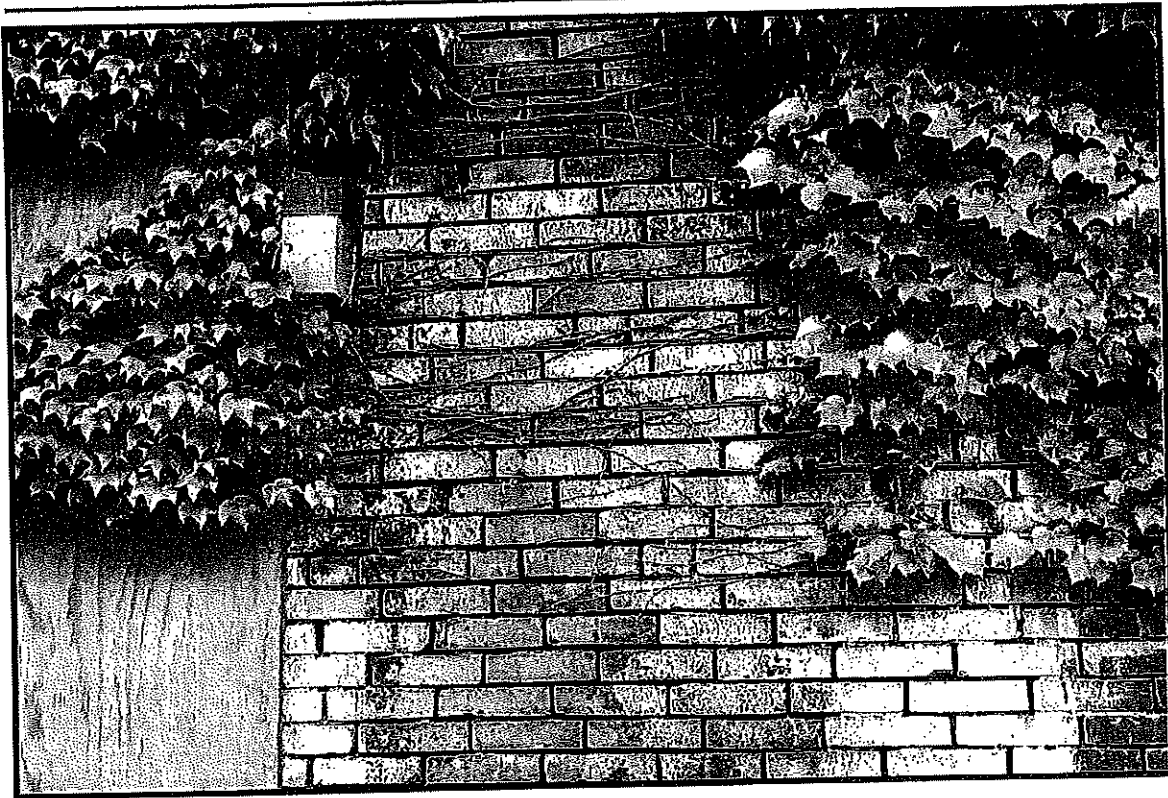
216 Washington Street East Elevation Deteriorated Mortar Joints.
